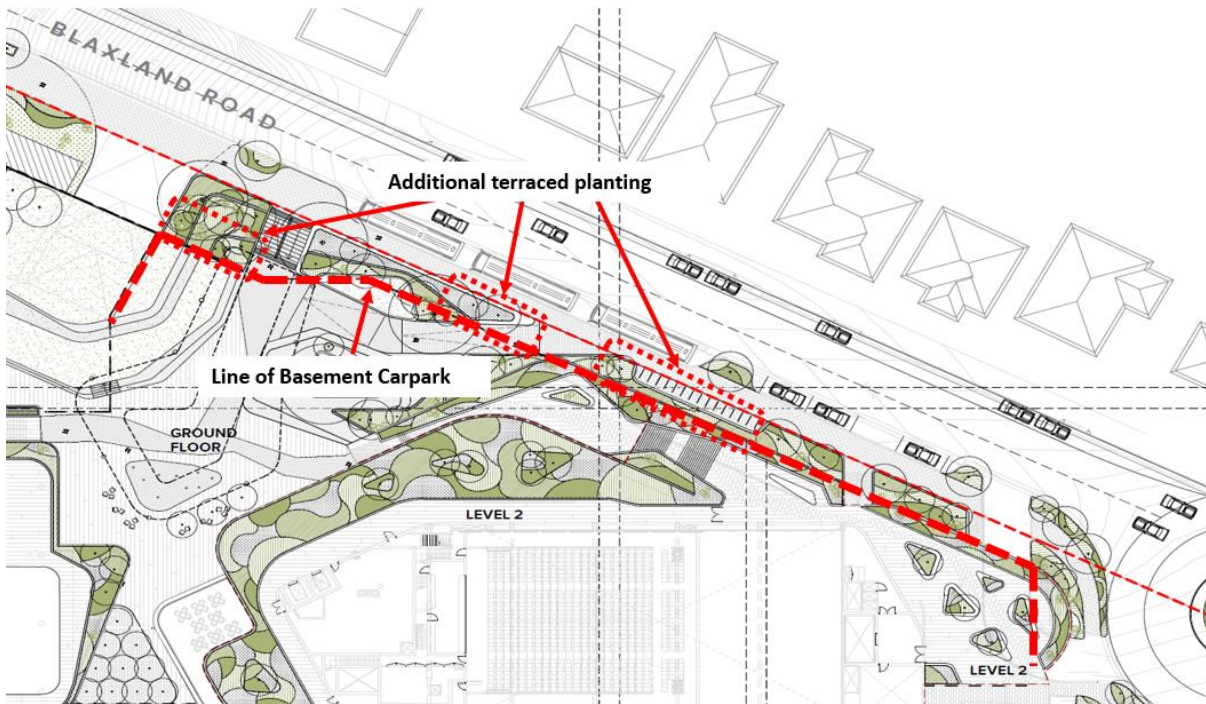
Amended alignment of basement car park and additional landscaping adjacent to Blaxland Road boundary
